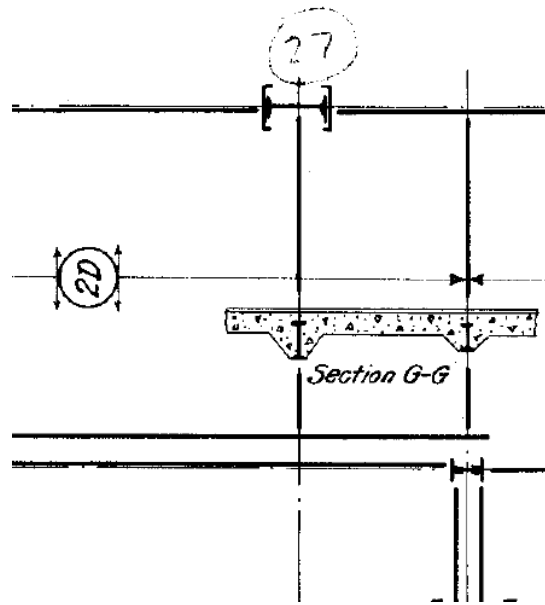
Close-up of beams encased in concrete (taken from Figure A.13)
